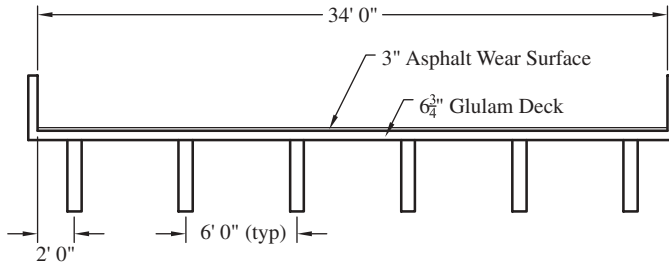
Bridge schematic—Example 19.2-1.
